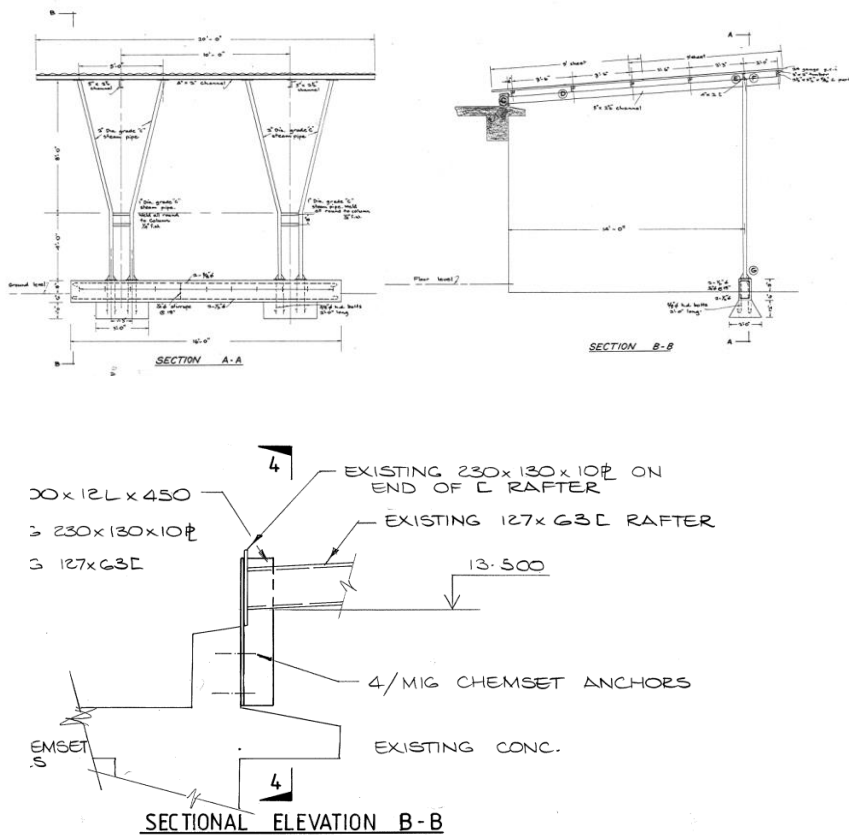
Original Exterior Canopy and Anchored Connection Back to the Workroom
